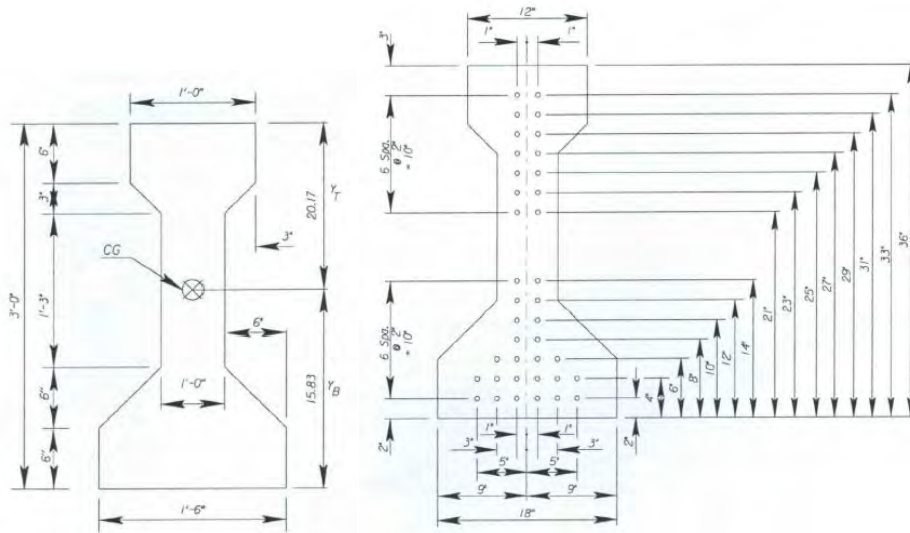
K-2 girder geometry and strand layout (KDOT 2016)
